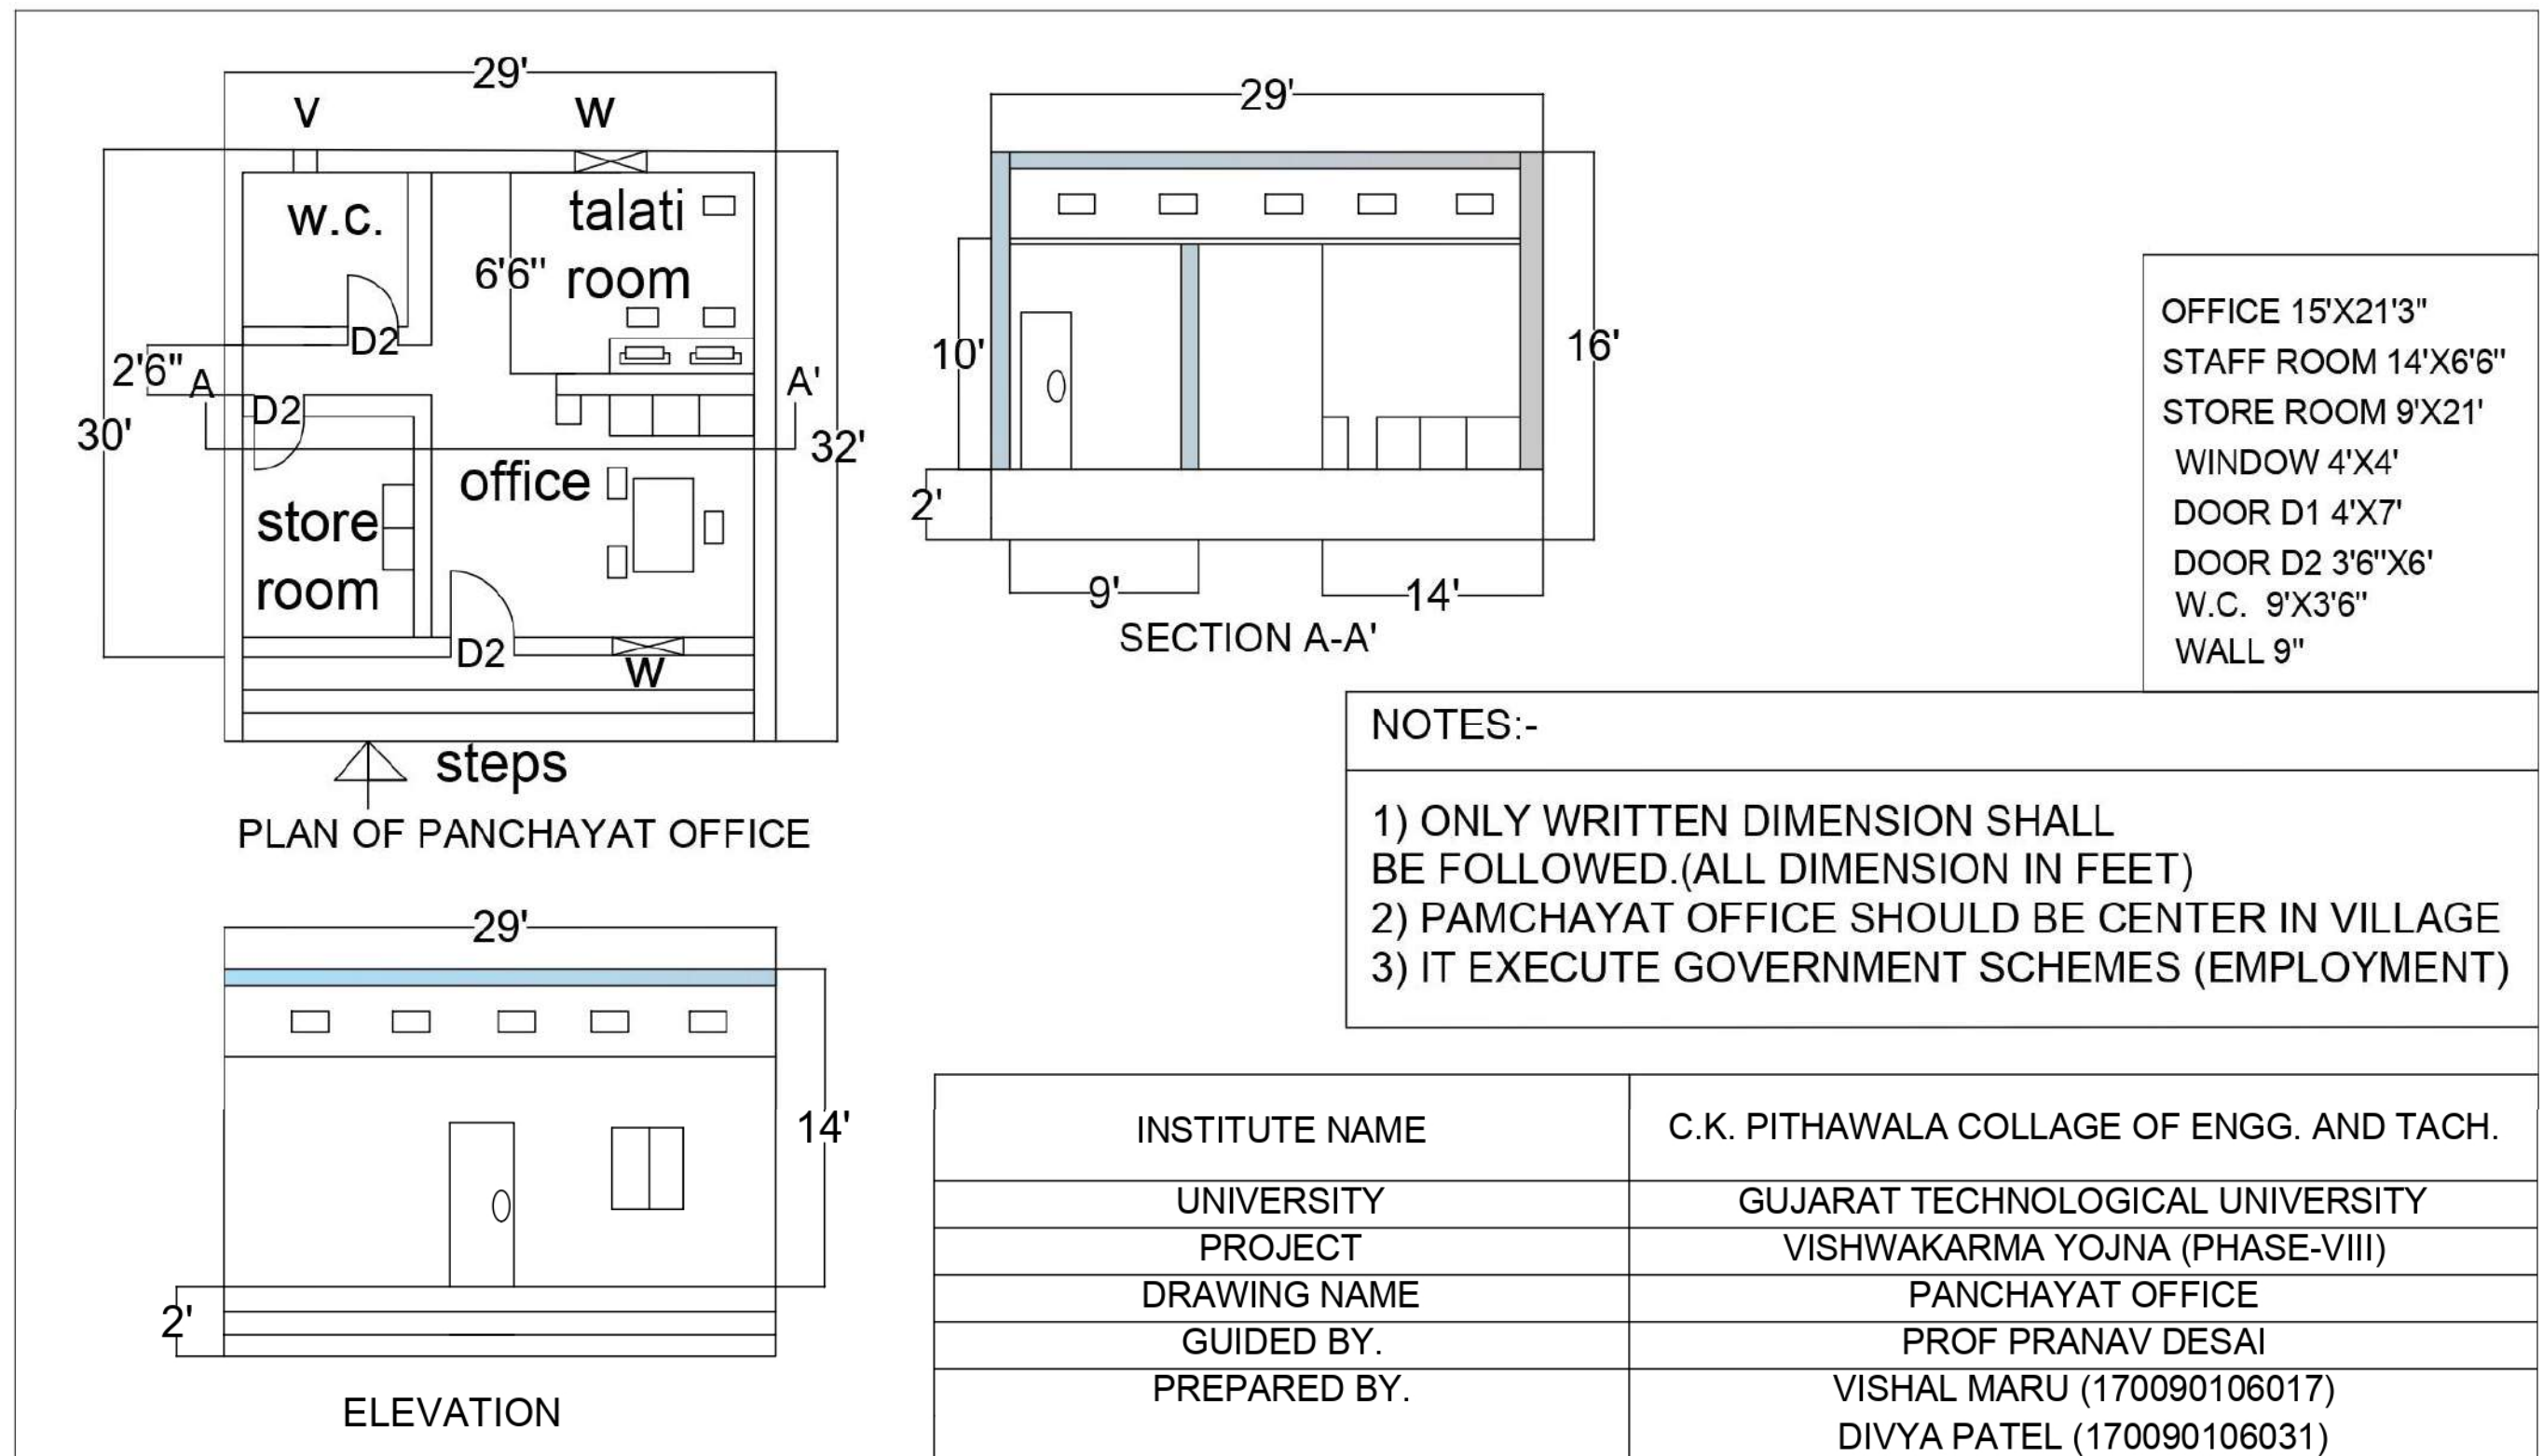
Plan, Section, Elevation of Reconstruction of Panchayat Building
